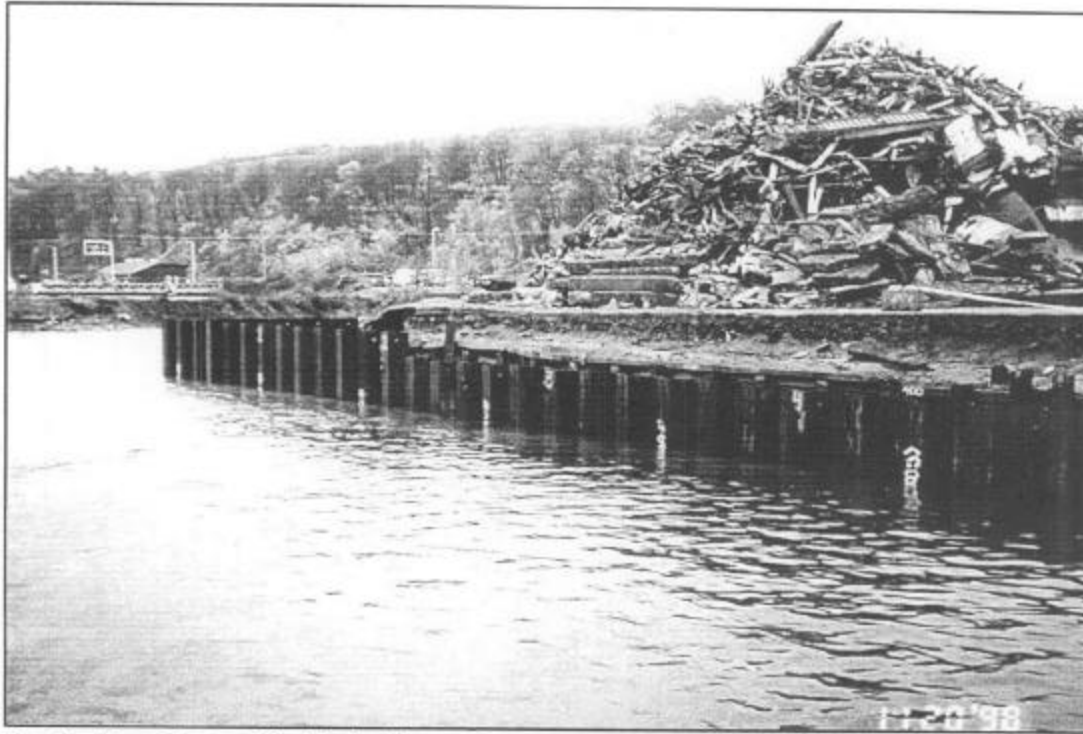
Geotextile Untied from Sheet Pile Wall before Placing Riprap
